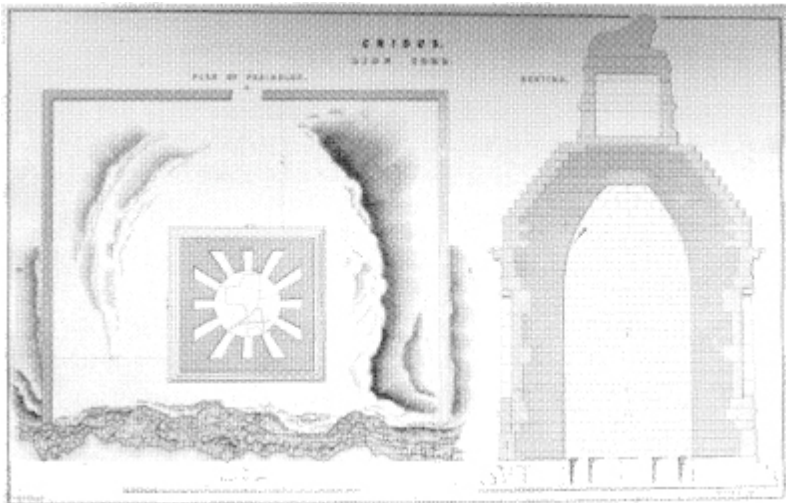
Ground plan and section of reconstruction of the Lion Tomb at Cnidus (after Newton, HD, pl. 62).
